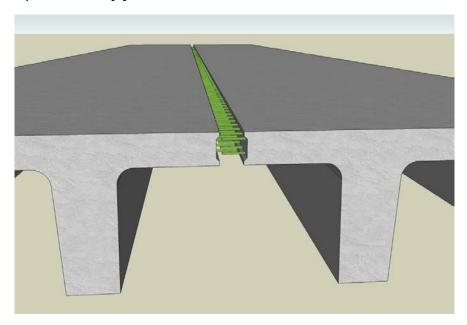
Potential UHPC Connection for the NEXT Beam (Northeast Extreme Tee)
